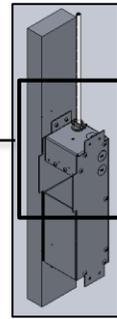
CONDUIT FITTING TO J-BOX ASSEMBLY
